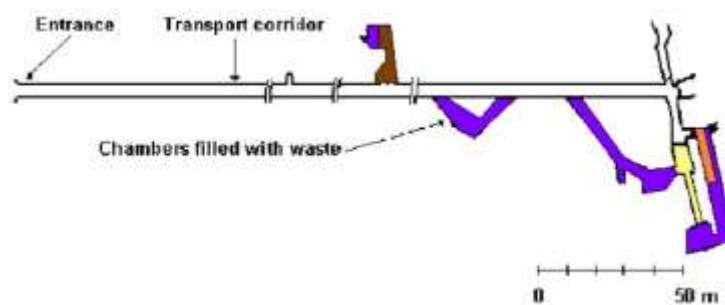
Radioactive Waste disposal facility Bratrstvi - layout [90]
